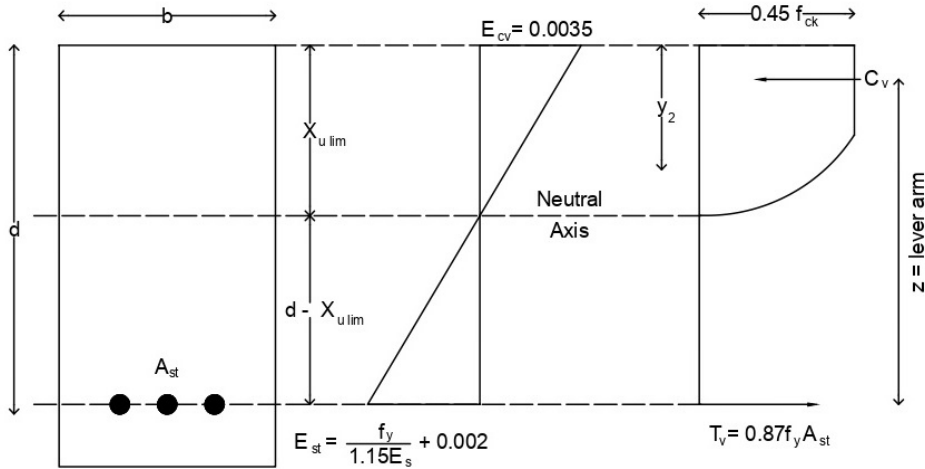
Reinforced concrete rectangular section at ultimate limit state of flexure singly reinforced beam
